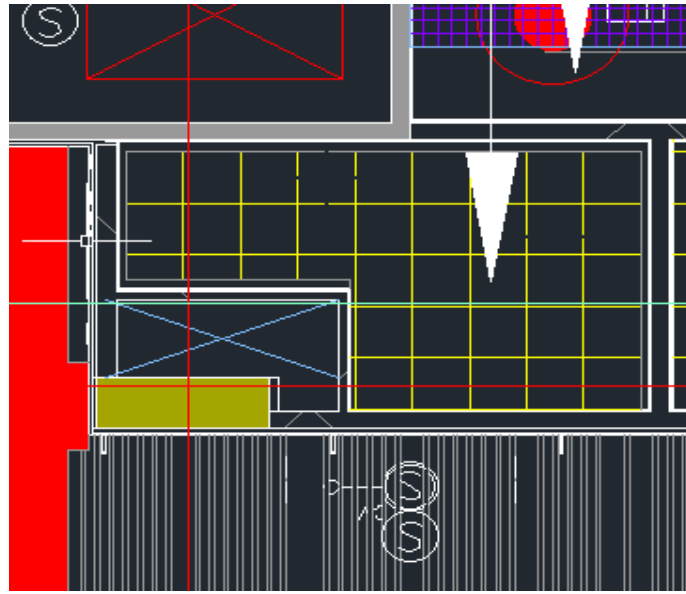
AutoCAD layout (Floor Plan) of a typical Toilet room
